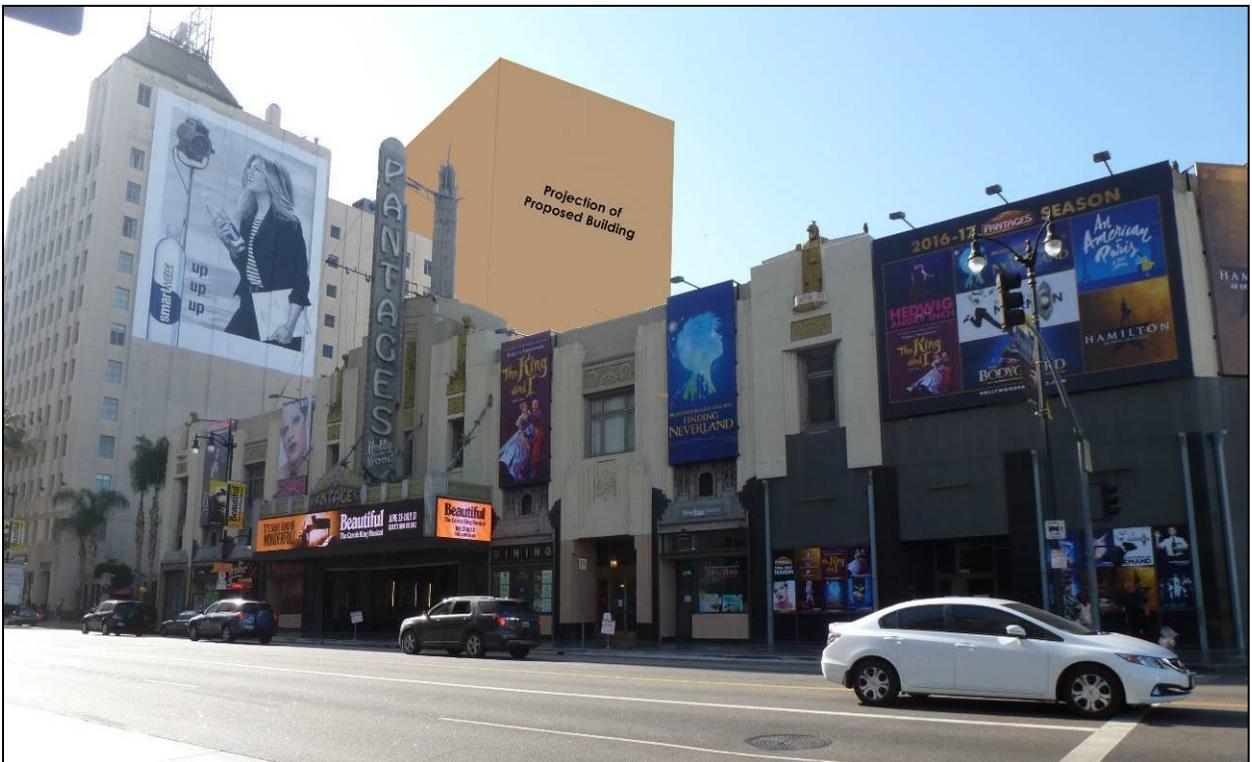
Current view of the Pantages' south elevation, looking northwest, with projection of the proposed project in the background.
